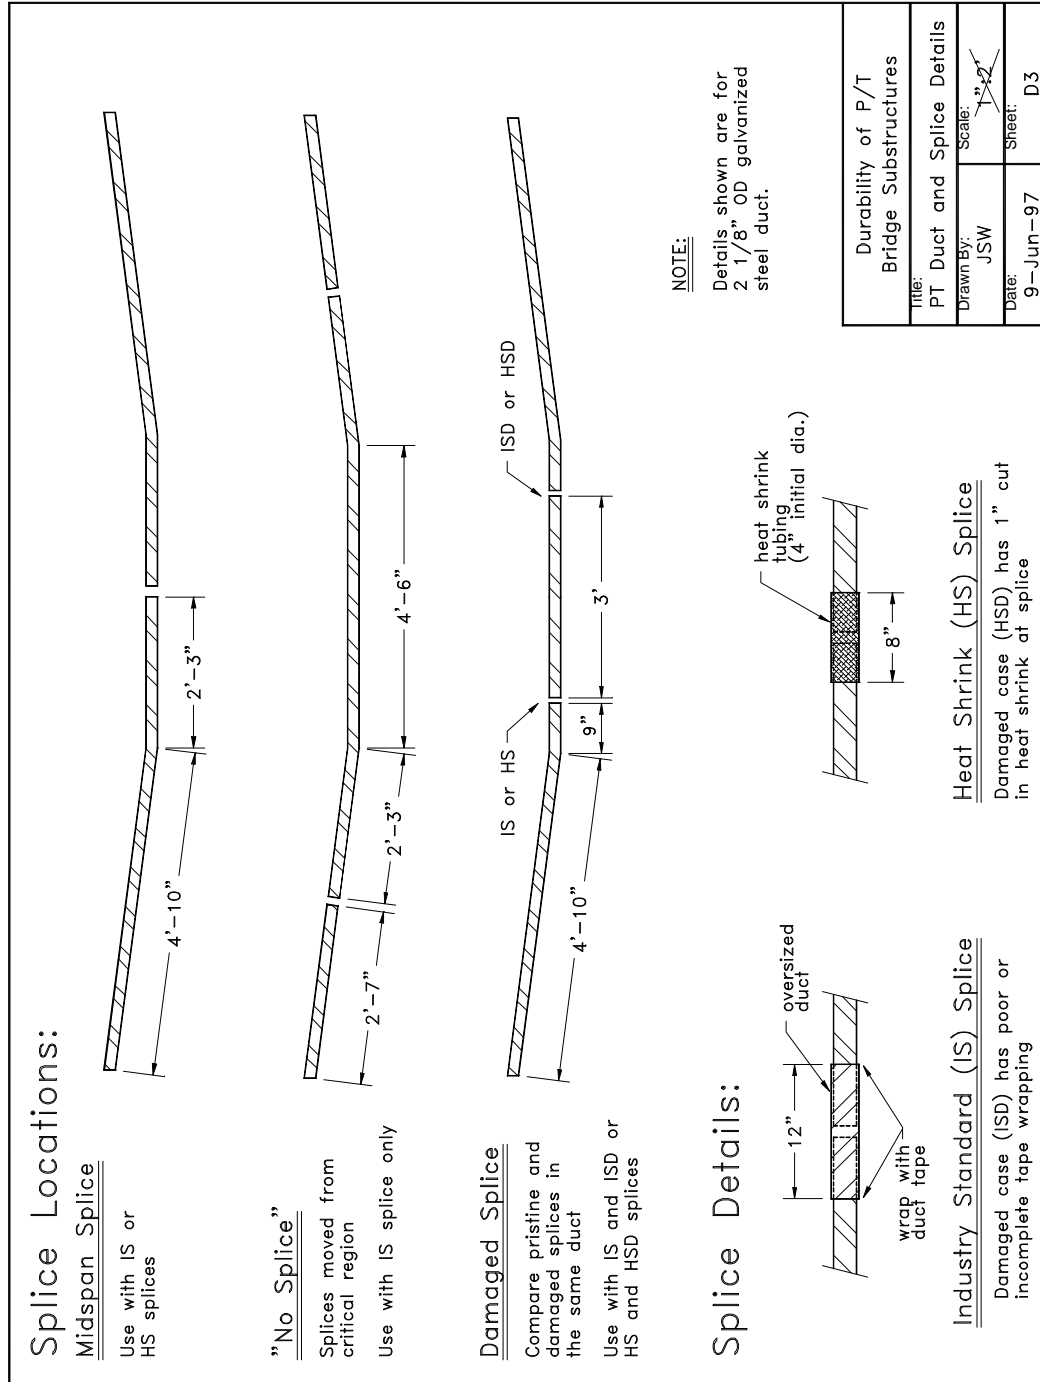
Sheet D3: Post-Tensioning Duct and Splice Details
